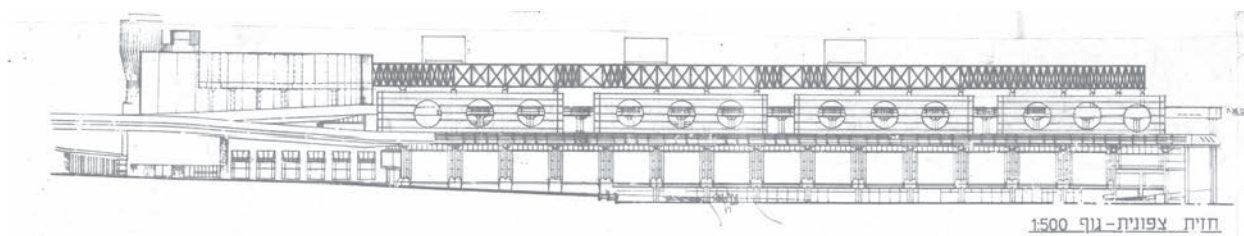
NORTH NEVE SHA'ANAN ST ELEVATION
